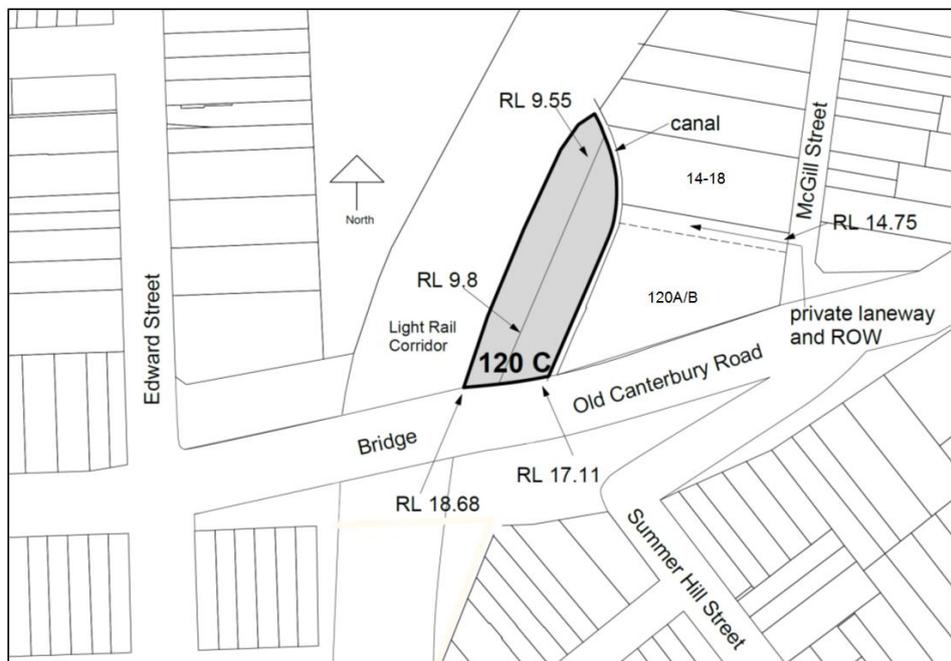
location of site shown in grey. Note the existing site levels are substantially lower than Old Canterbury Road.
